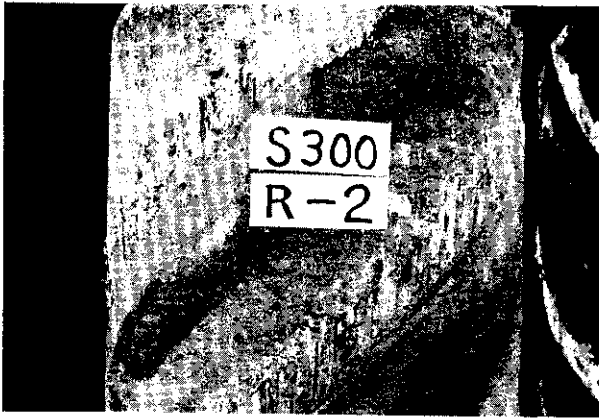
Crushed concrete at the rib after push-out test (S 300 FR-2)
